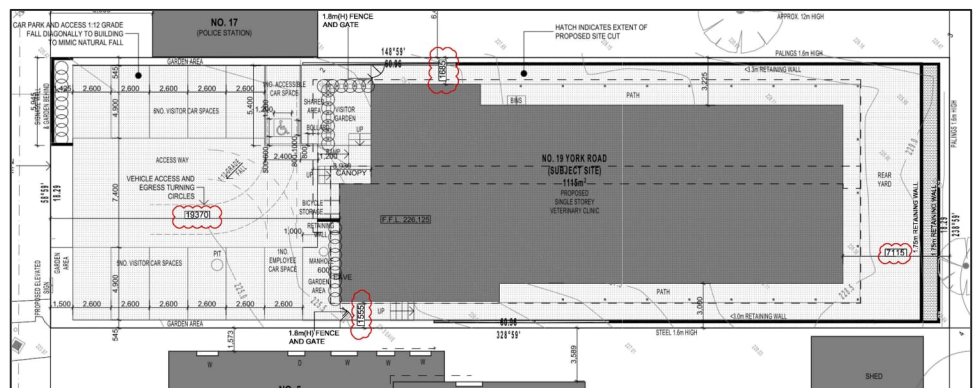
Extract of Endorsed Plans for Planning Permit YR-2014/957/2
